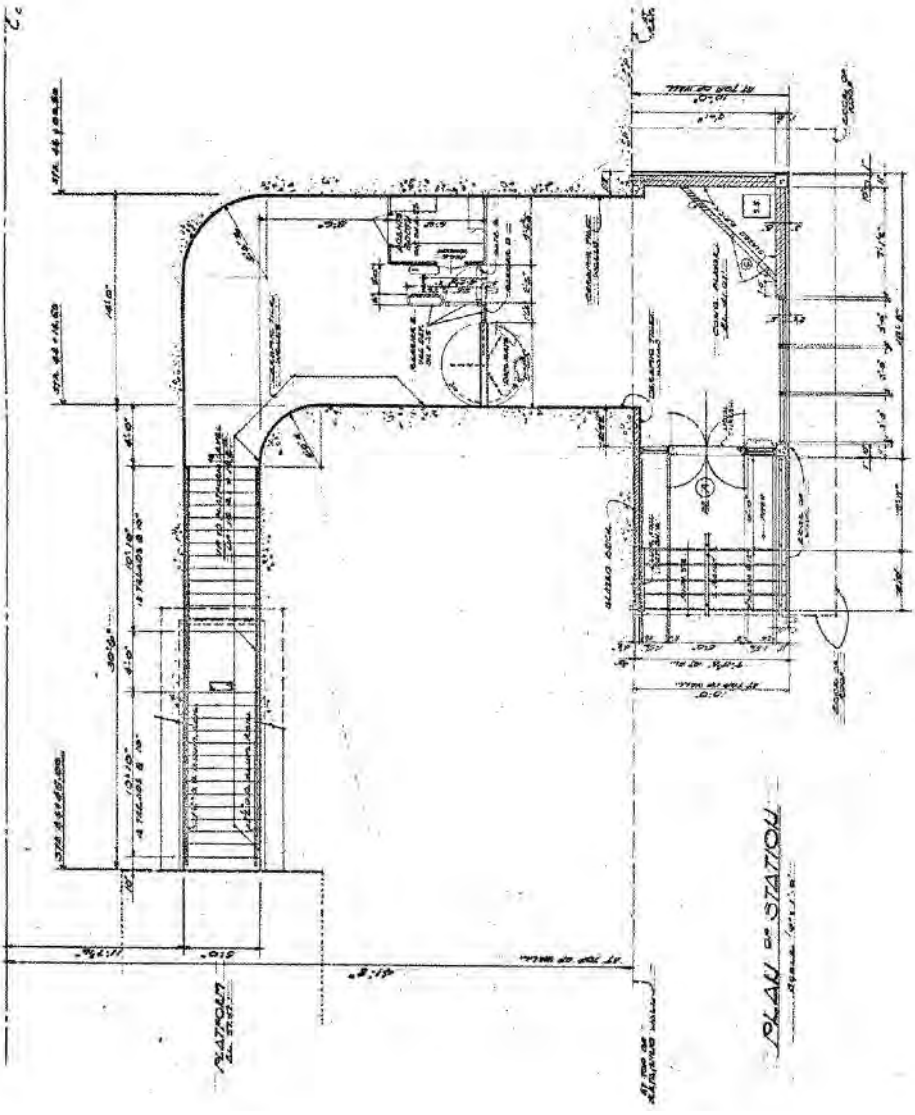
Excerpt from historical drawings of the Mason (auxiliary) Stationhouse plan, 1961. Courtesy of the CTA.
